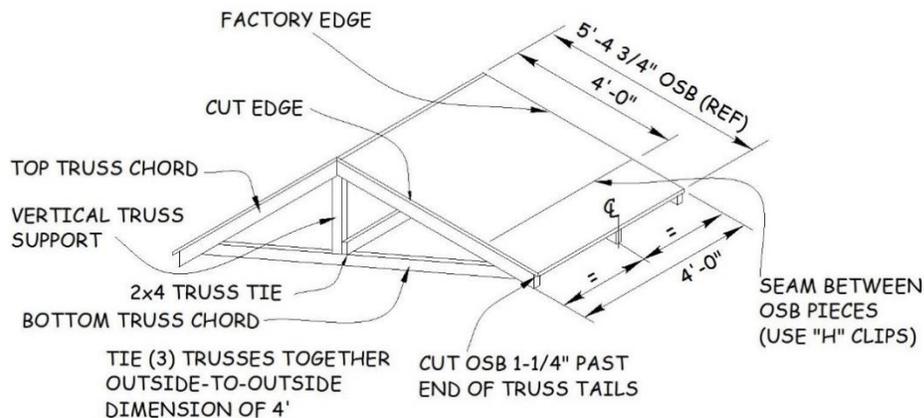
Shed Truss Component Assembly – Two Req'd.
